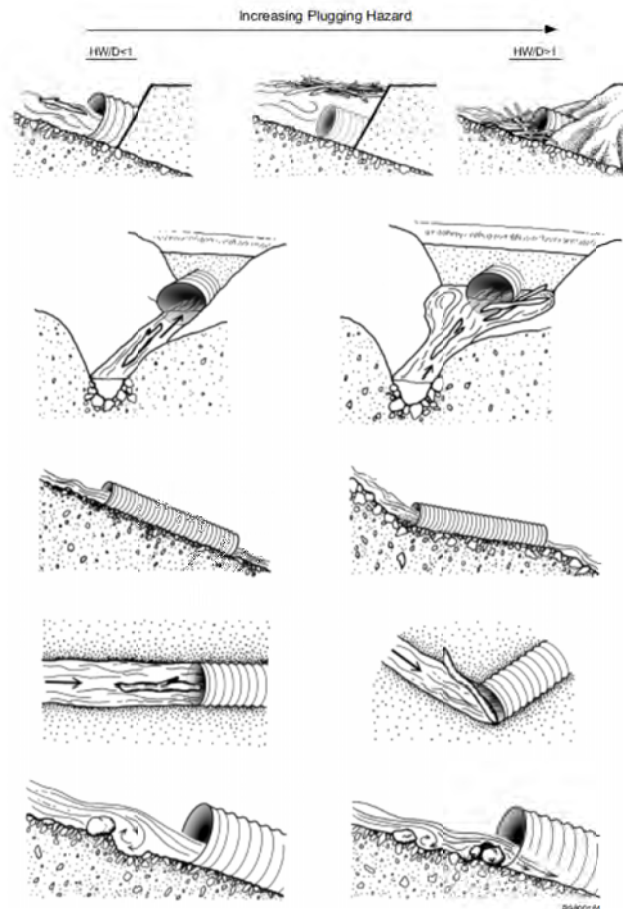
Schematic of increased plugging hazard for culverts when floodwaters fill over the top of the structure. (Source: Furniss et al., 1998)
